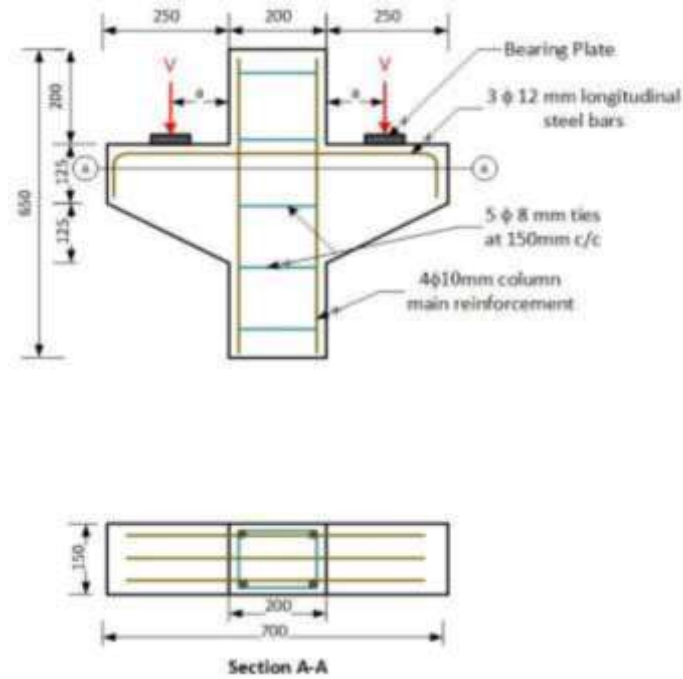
Details of the corbel specimen (all dimensions are in mm)
